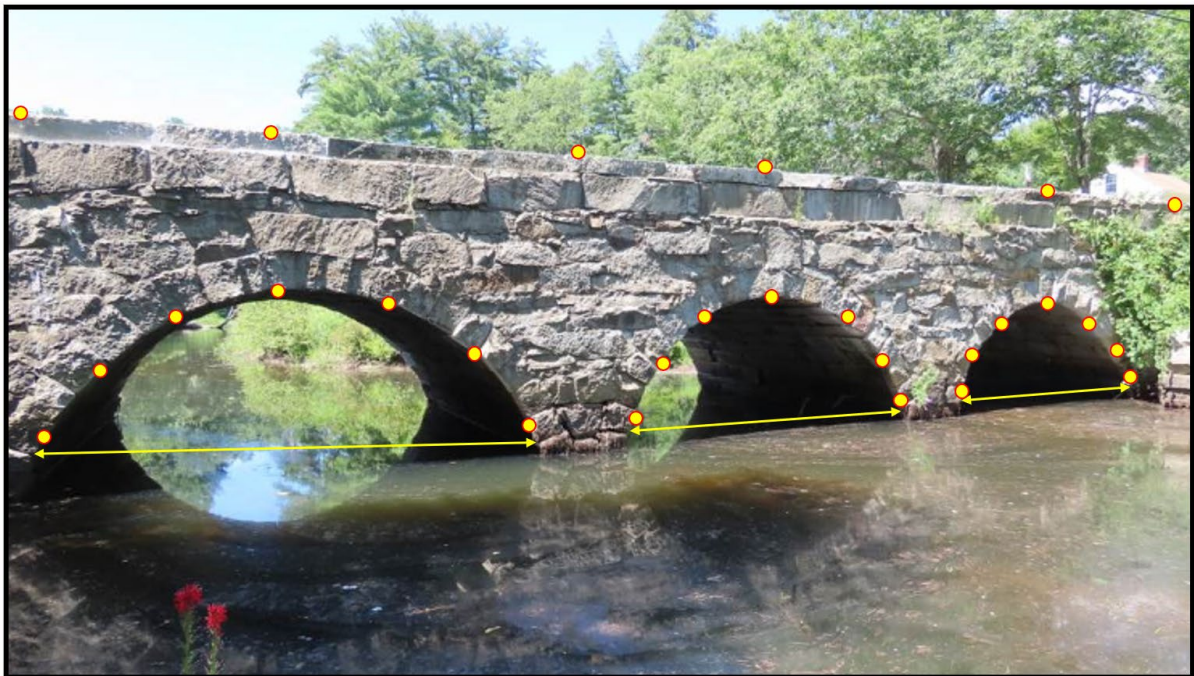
(d): Multi-Arch Bridge Survey Locations
